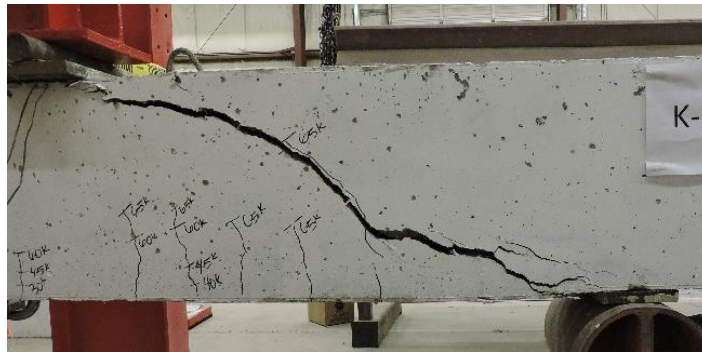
Eco-Bridge-Crete 1 Failure Cracks
